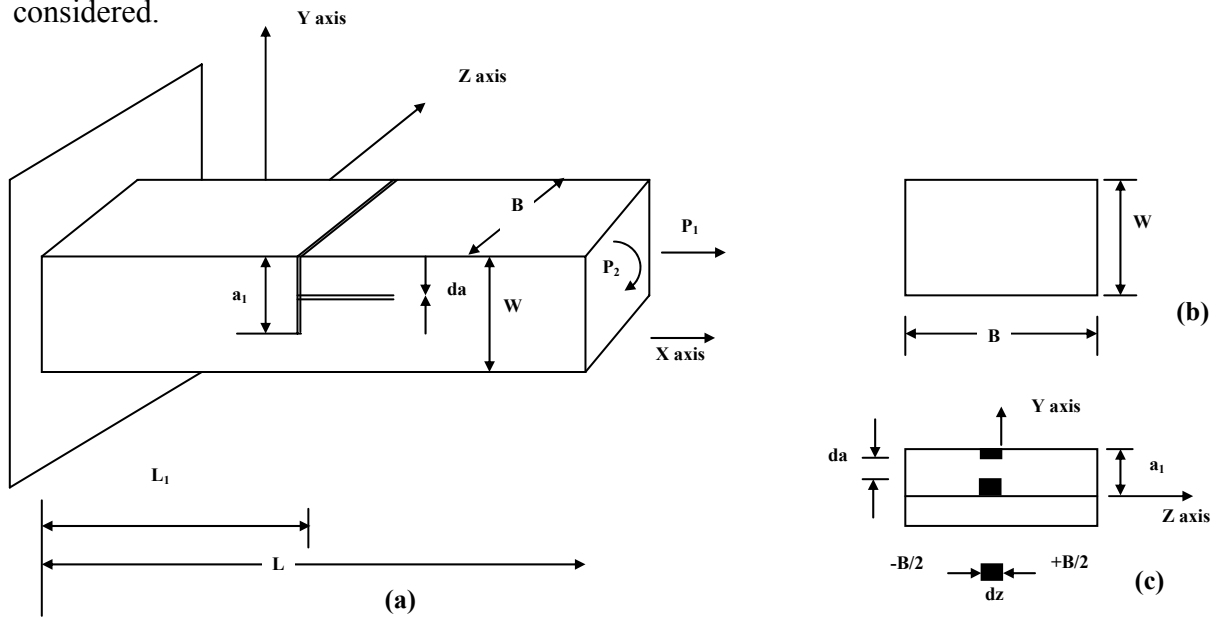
Geometry of beam, (a) cantilever beam, (b) cross-sectional view of the beam. (c) segments taken during integration at the crack section
